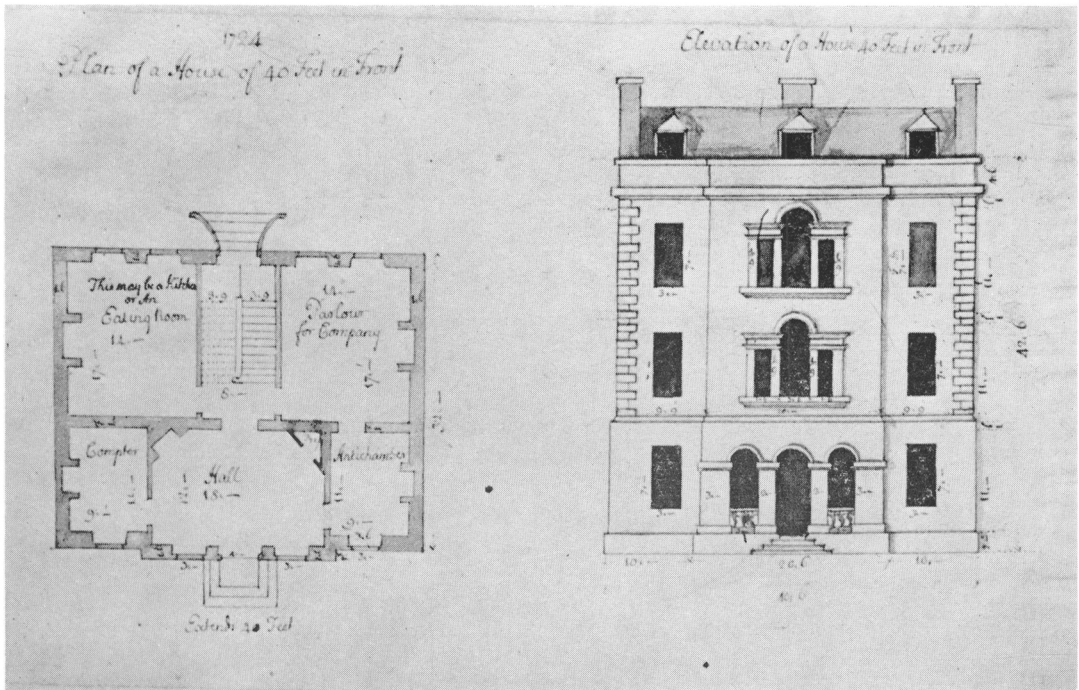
Elevation and plan of a house of 40 ft frontage, 1724 [9]
